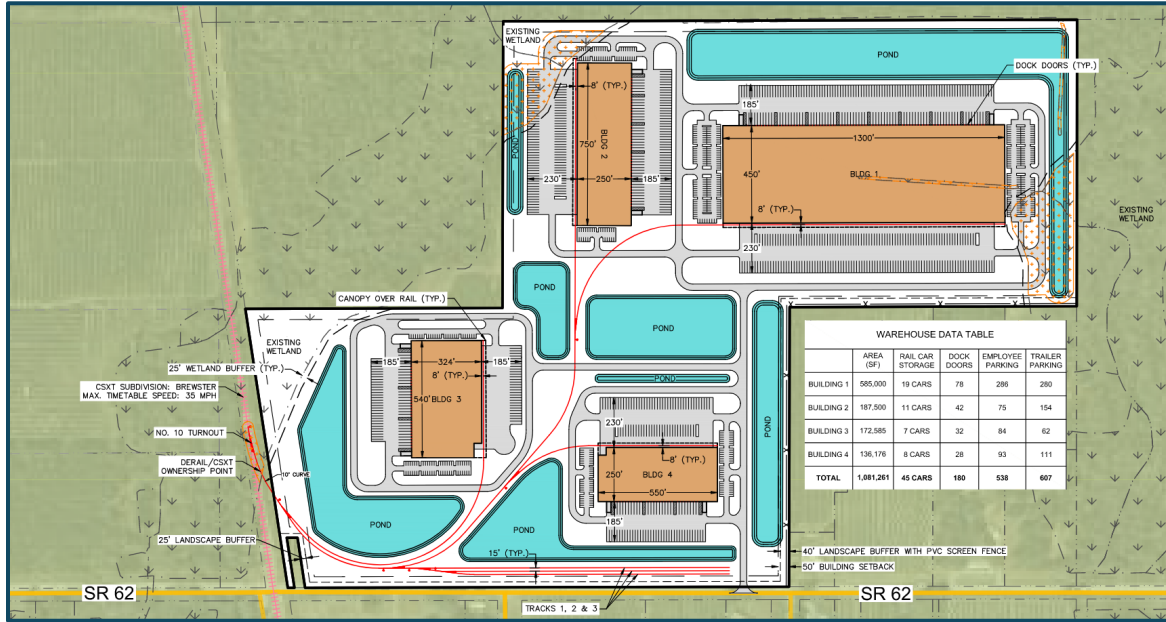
Rail-Centric Site 5 Conceptual Site Plan
